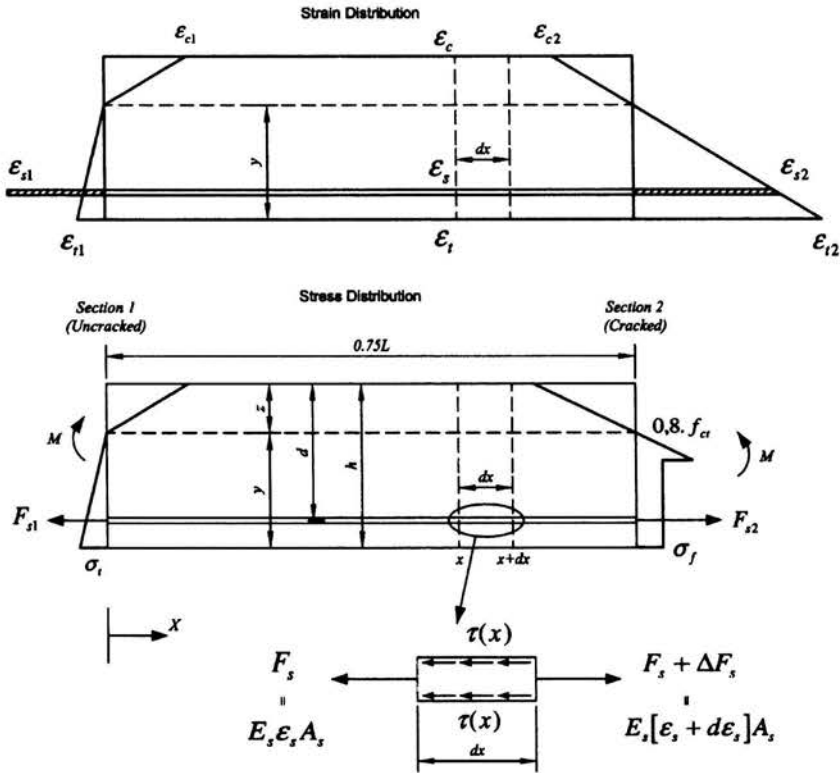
Beam fragment between a cracked section and a section that is situated in the middle of two cracks.
